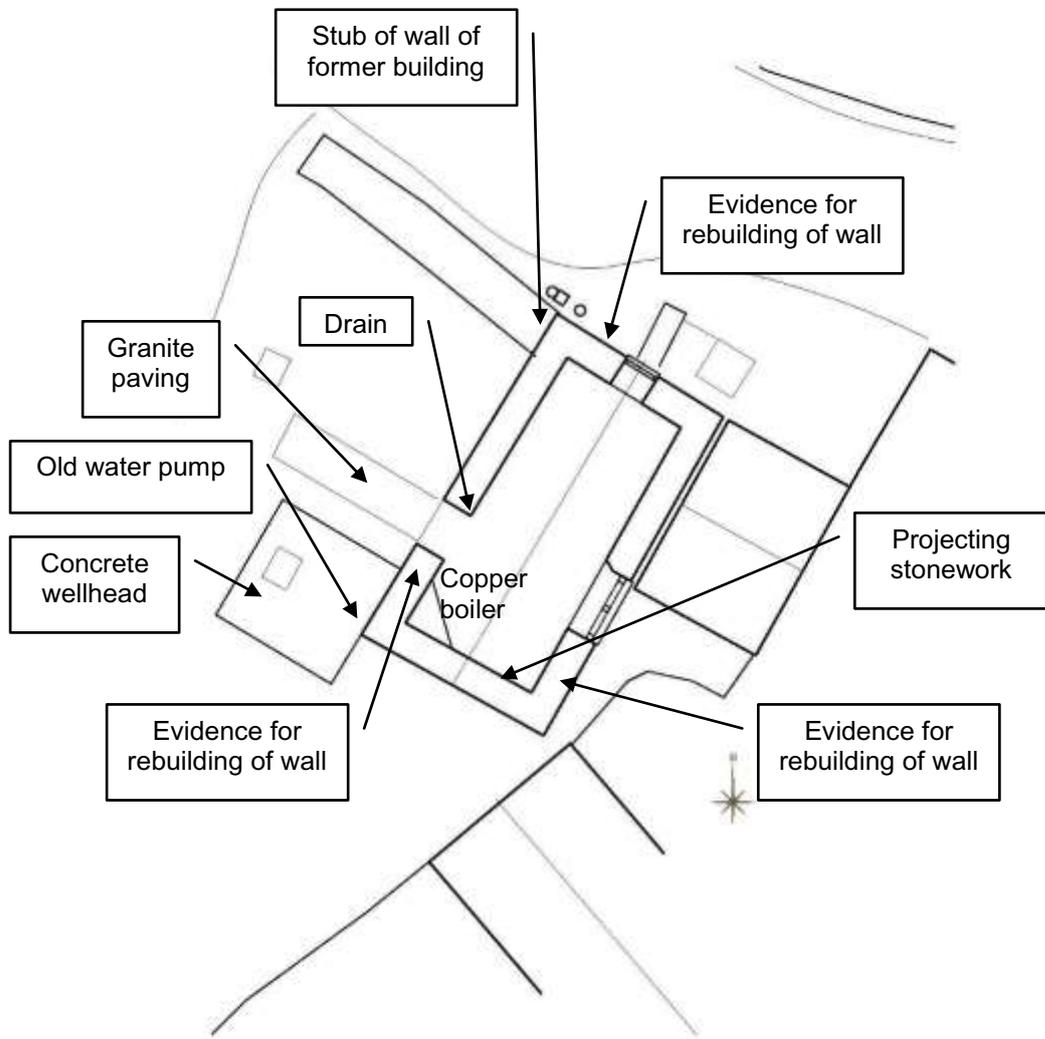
Plan of Barn 1 - 1:100 scale (Andy Travers, ATA Practice)
